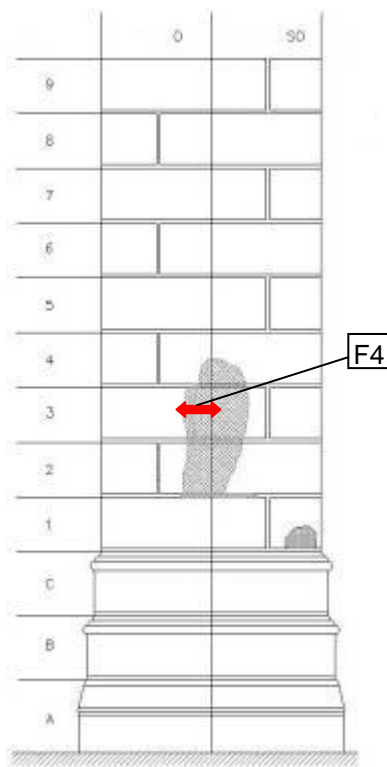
Monitoring of crack in pier 6N (Roca, 2004)
